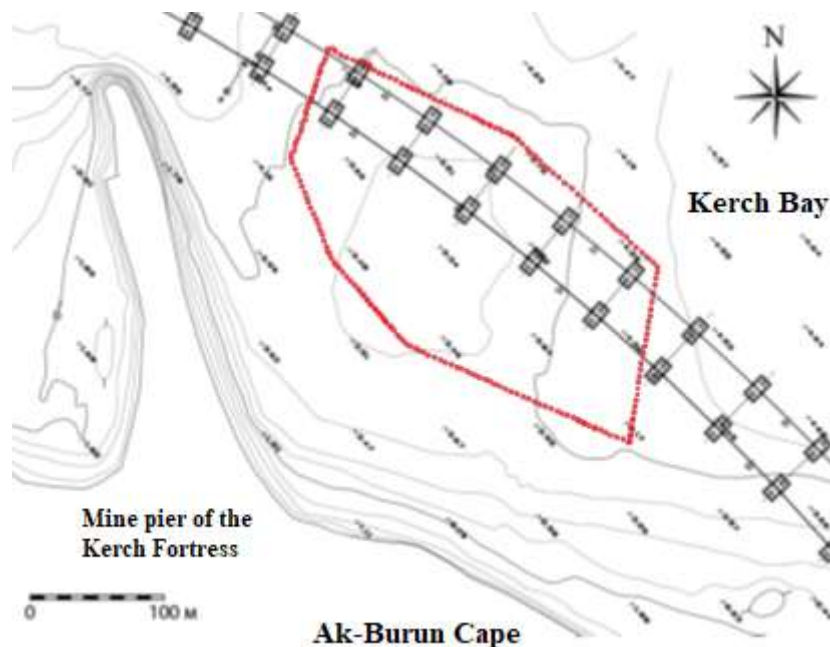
Kerch-Taman bridge crossing route near Ak-Burun Cape.
